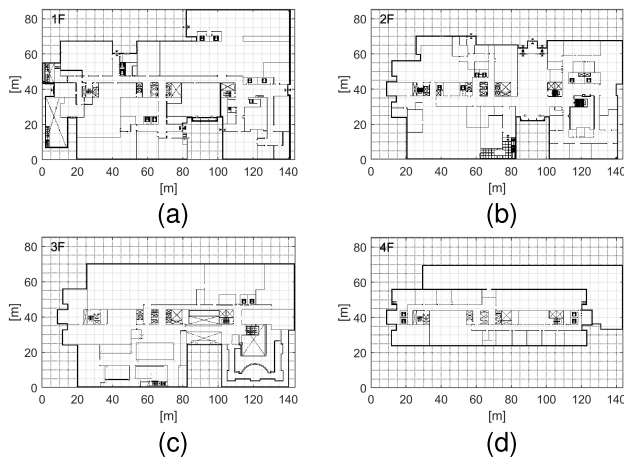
Building floor plans. (a) 1F. (b) 2F. (c) 3F. (d) 4F.
